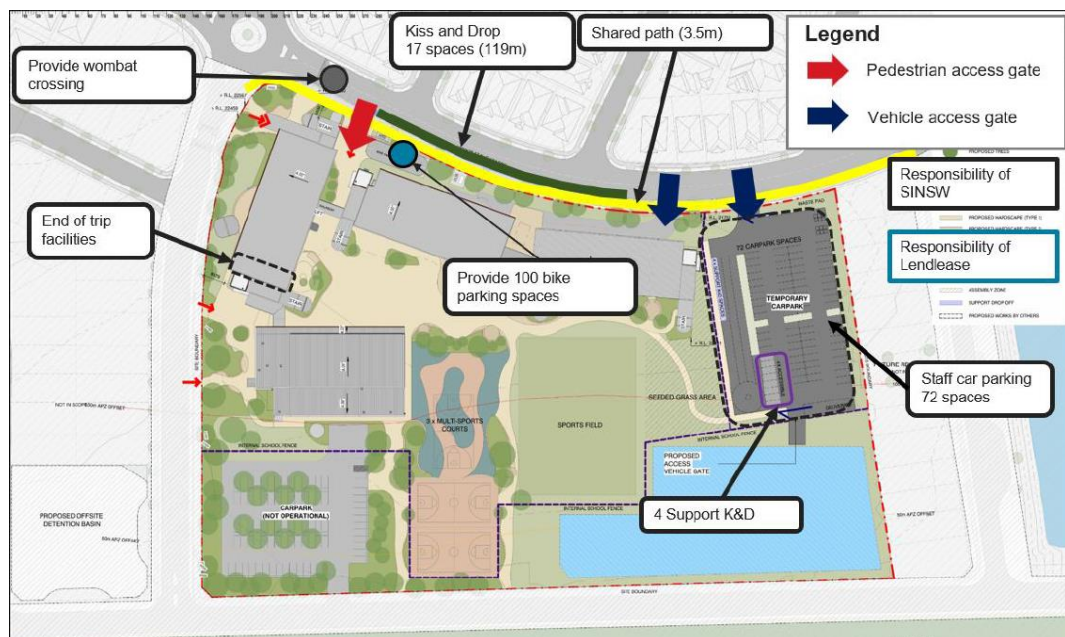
Site Access and Parking Arrangements – Stage 2 with temporary works
